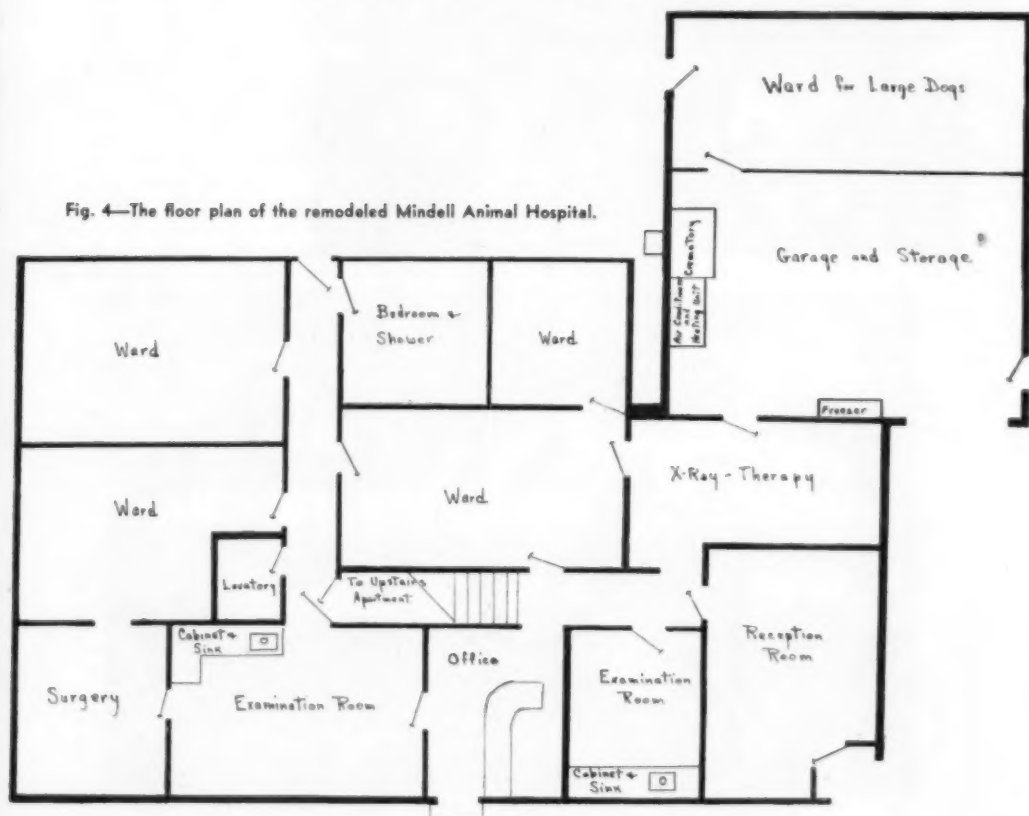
The floor plan of the remodeled Mindell Animal Hospital.
